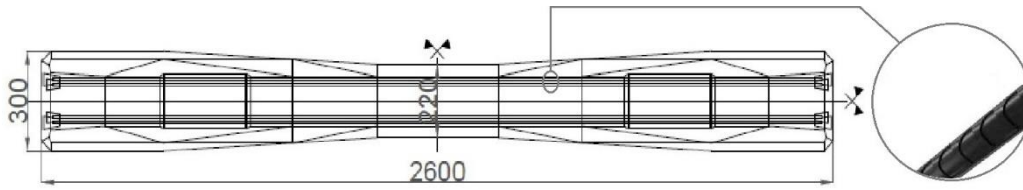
Schematics of a prestressed sleeper from top view (unit: mm) and detail of the Y1570C prestressing bar of  $\varnothing 9.5$  mm.
